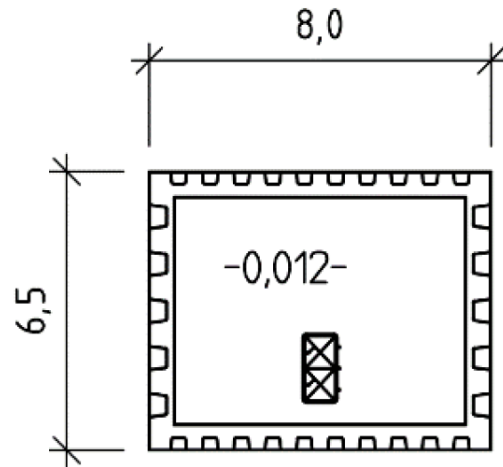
Cross-section of cross beams (Larsen, 2016a)
